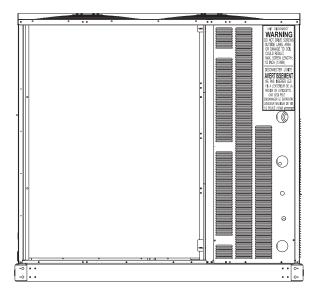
Mounting Position for Field Disconnects (up to 100A)
